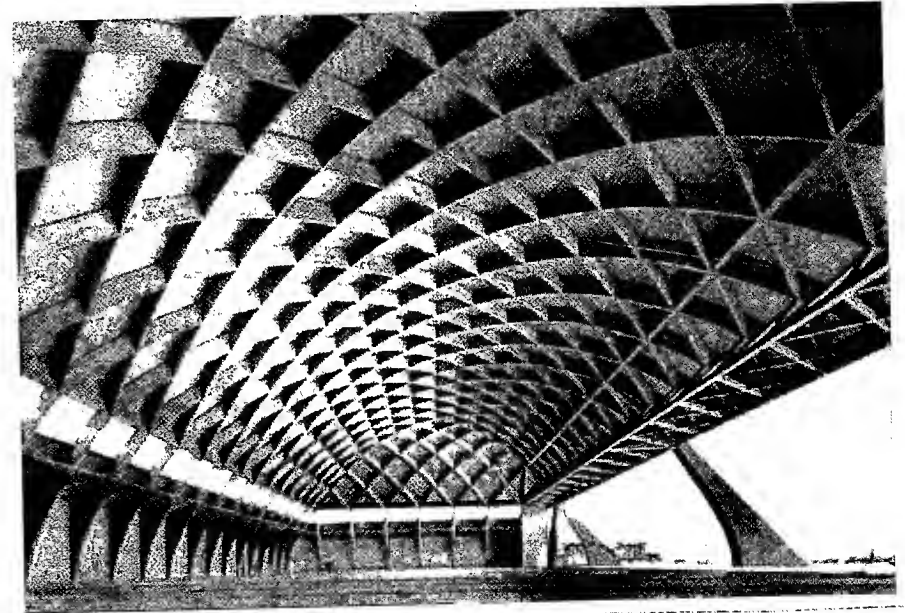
Reinforced concrete airplane hanger, Italy.
